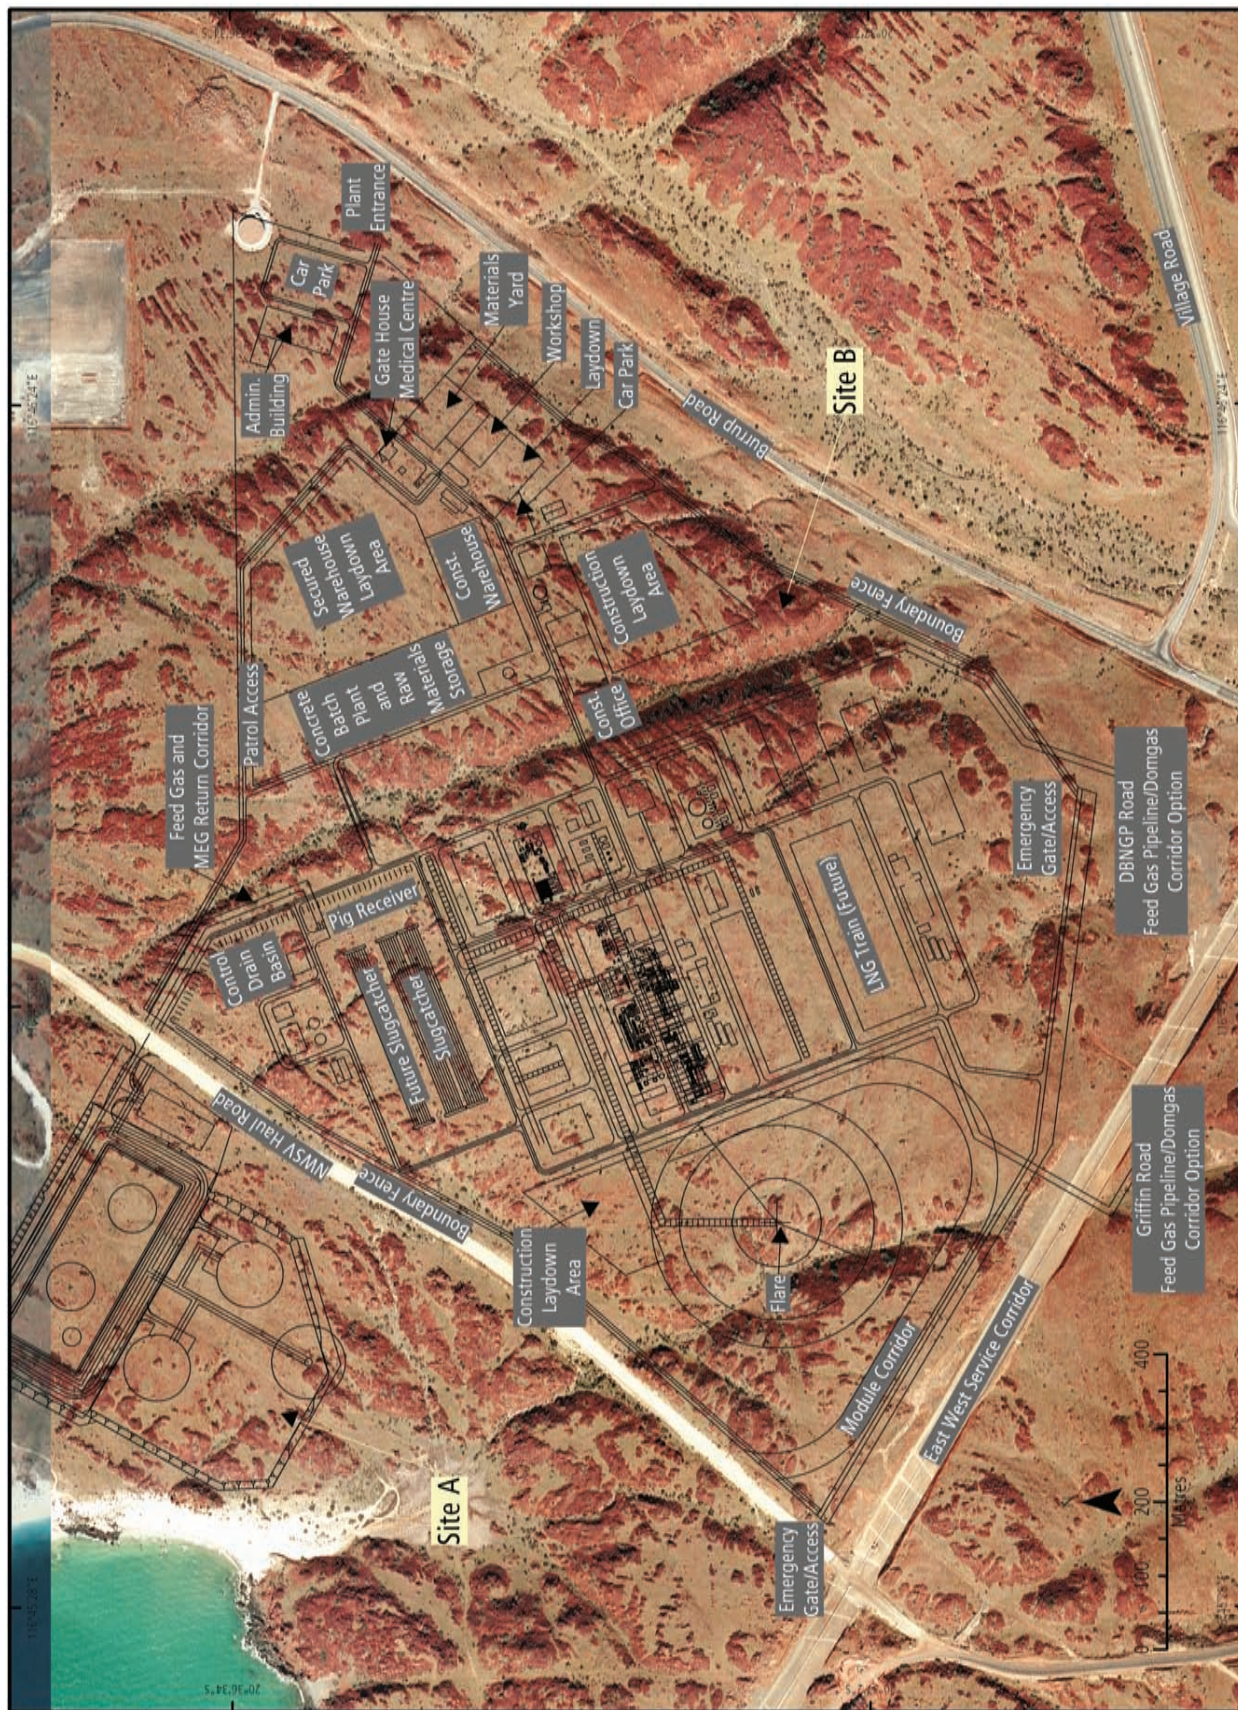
Site A Gas Storage and Export Facilities Layout
